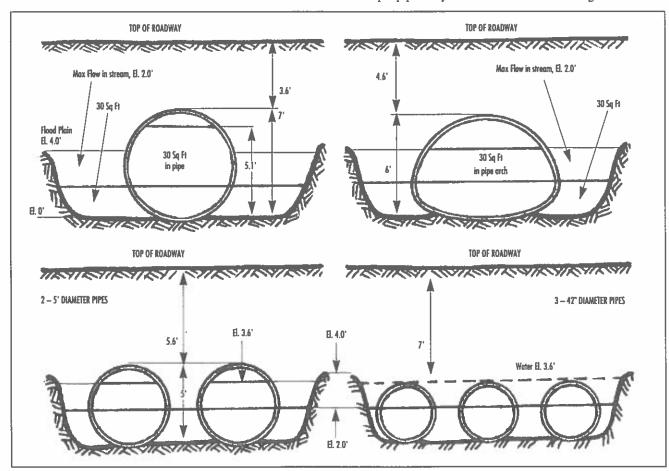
Pipe arch or multiple pipes used to reduce flood height.
